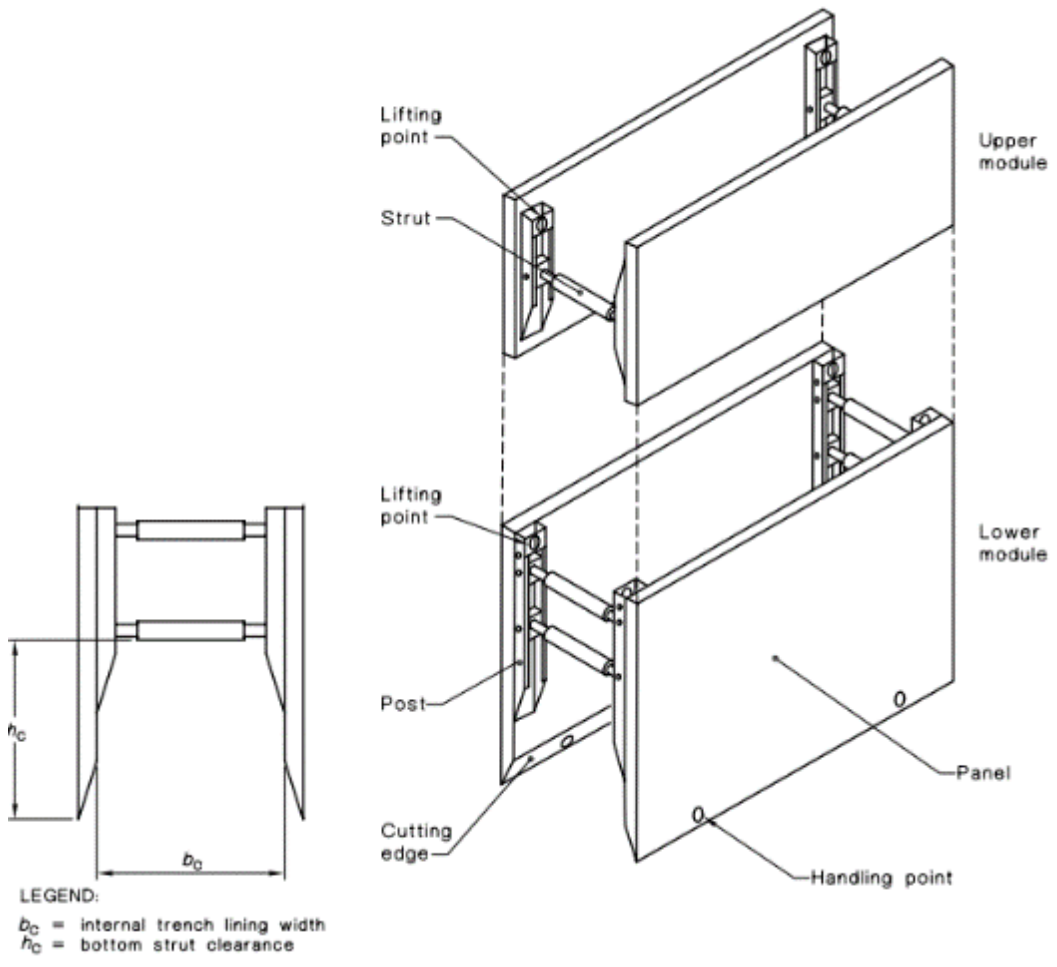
Example of a typical trench box (p.9 Standards Australia 2000)
